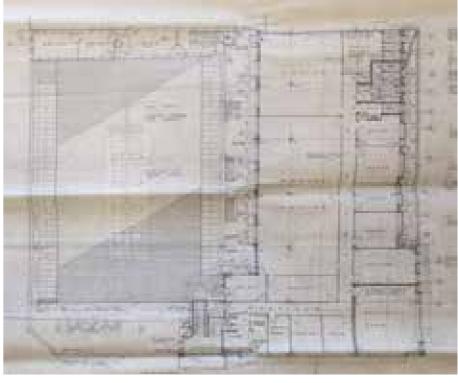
1958 Allied Bakeries scheme, first floor and roof plant plan.
